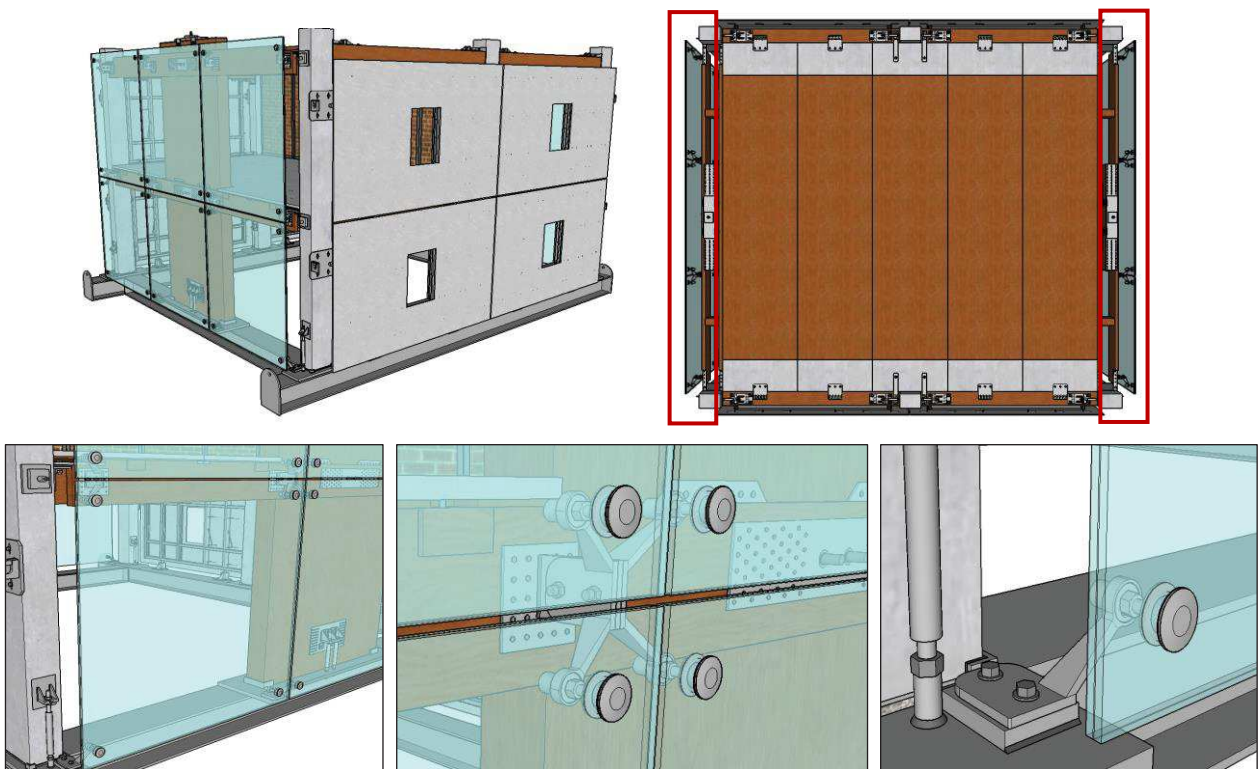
Renders of *Option 2* configuration: global view (top - left), distribution in plan of the glass facades (top - right), view of a glass panel between level 0 and 1 (bottom - left), detail of a connection to the timber beam (bottom - centre), detail of a connection to the foundation (bottom - right).
